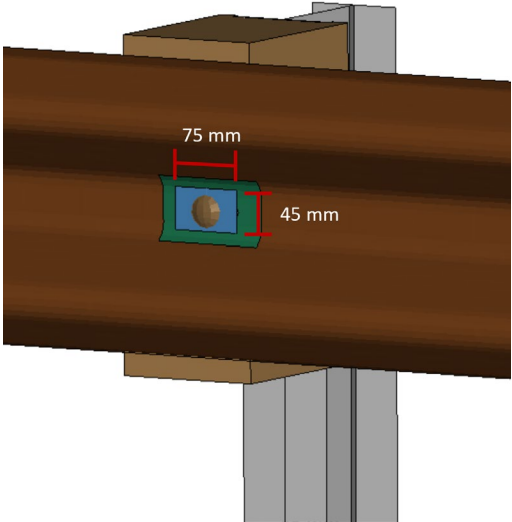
2.2.23 – Mounted Guardrail Washer
